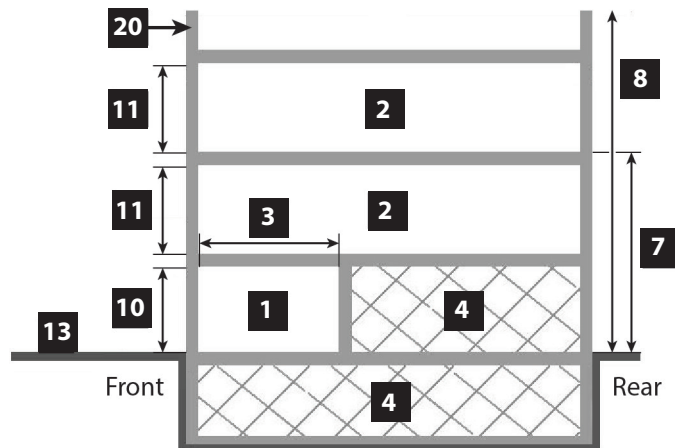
Limited bay building height and use diagram shown with basement and rear building interior parking, storefront entry type, and parapet roof type. Not to scale.
